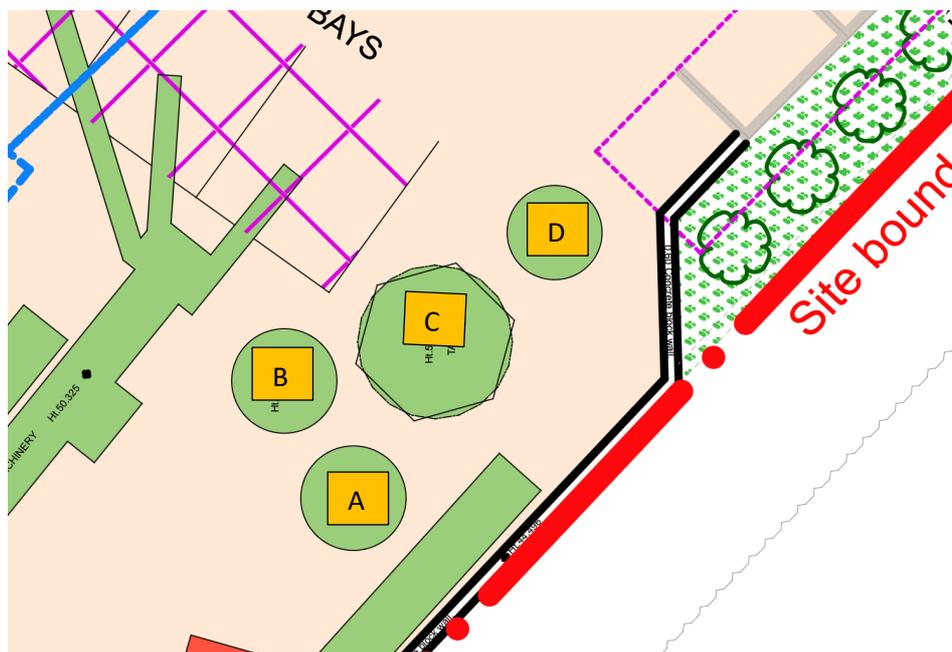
Snapshot taken from Drawing 100 Rev C Site Layout Plan showing position of Tanks A to D
